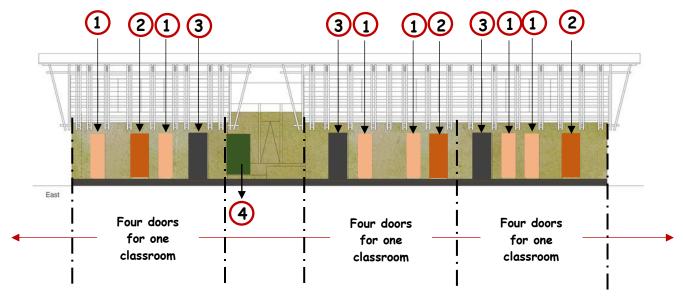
East Elevation: Three different size doors are randomly arranged on the east side (ArchDaily, 2010).
